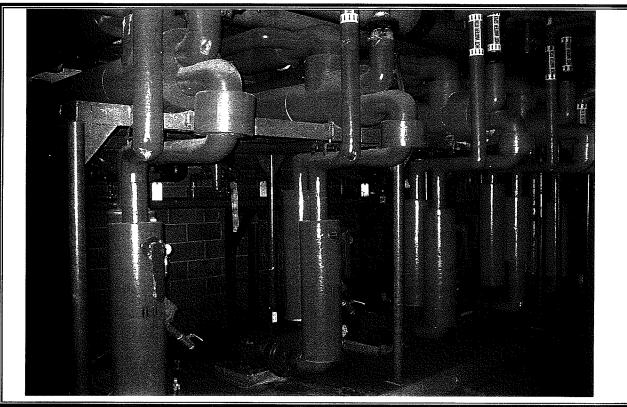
Photo Date 12/05/06 McCurdy Building Heating hot water pumps and steam to hot water converters
